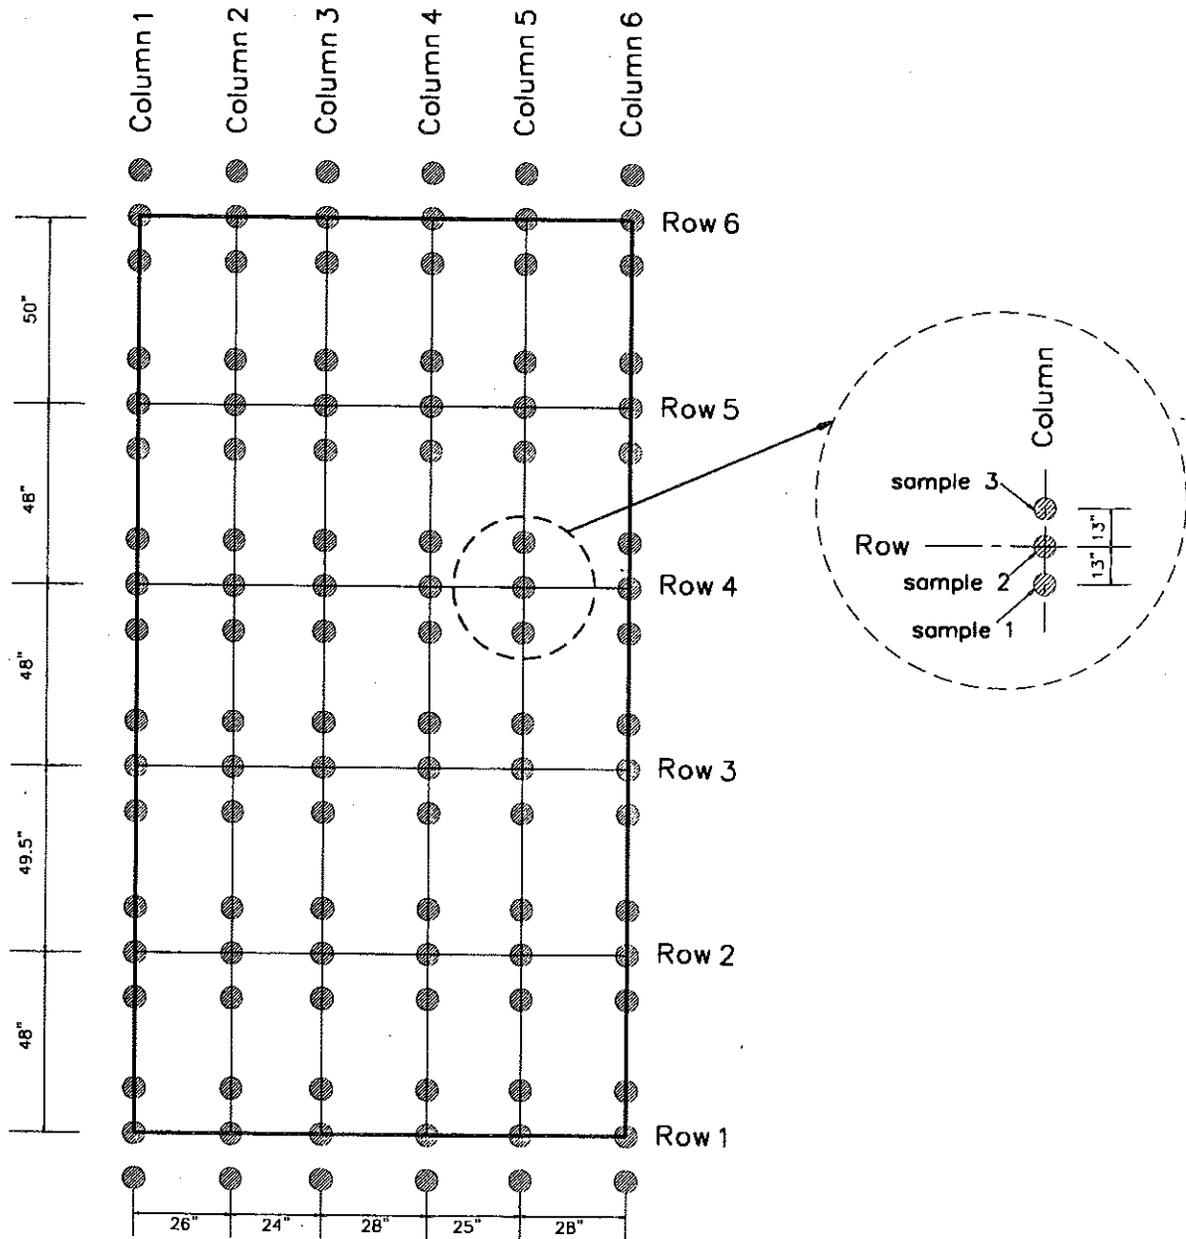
Layout of Sampling Grid at Site 1 - St. John's
